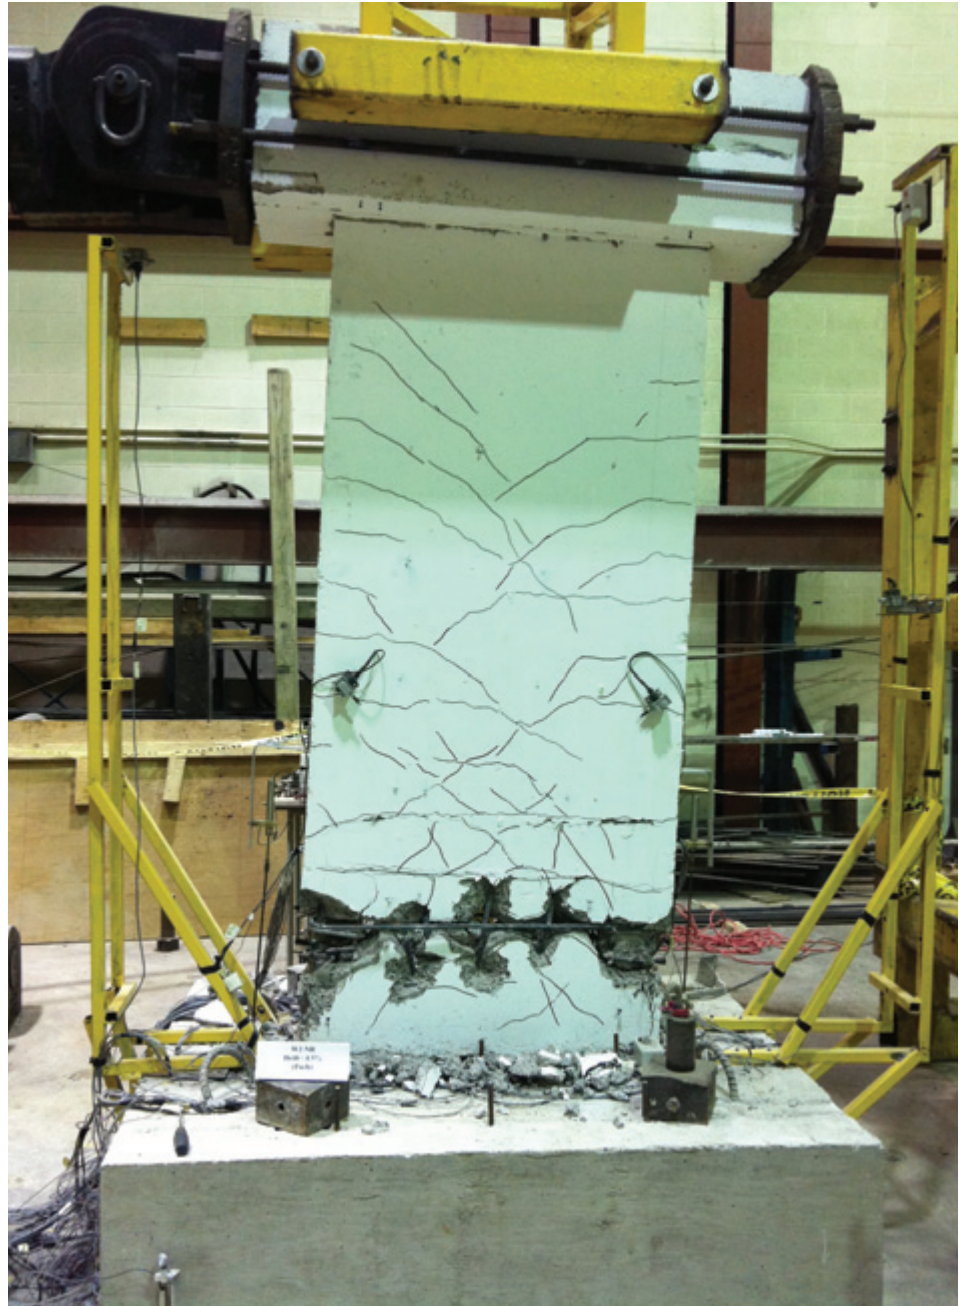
(a): SMA shear wall (Abdulridha and Palermo 2013).
